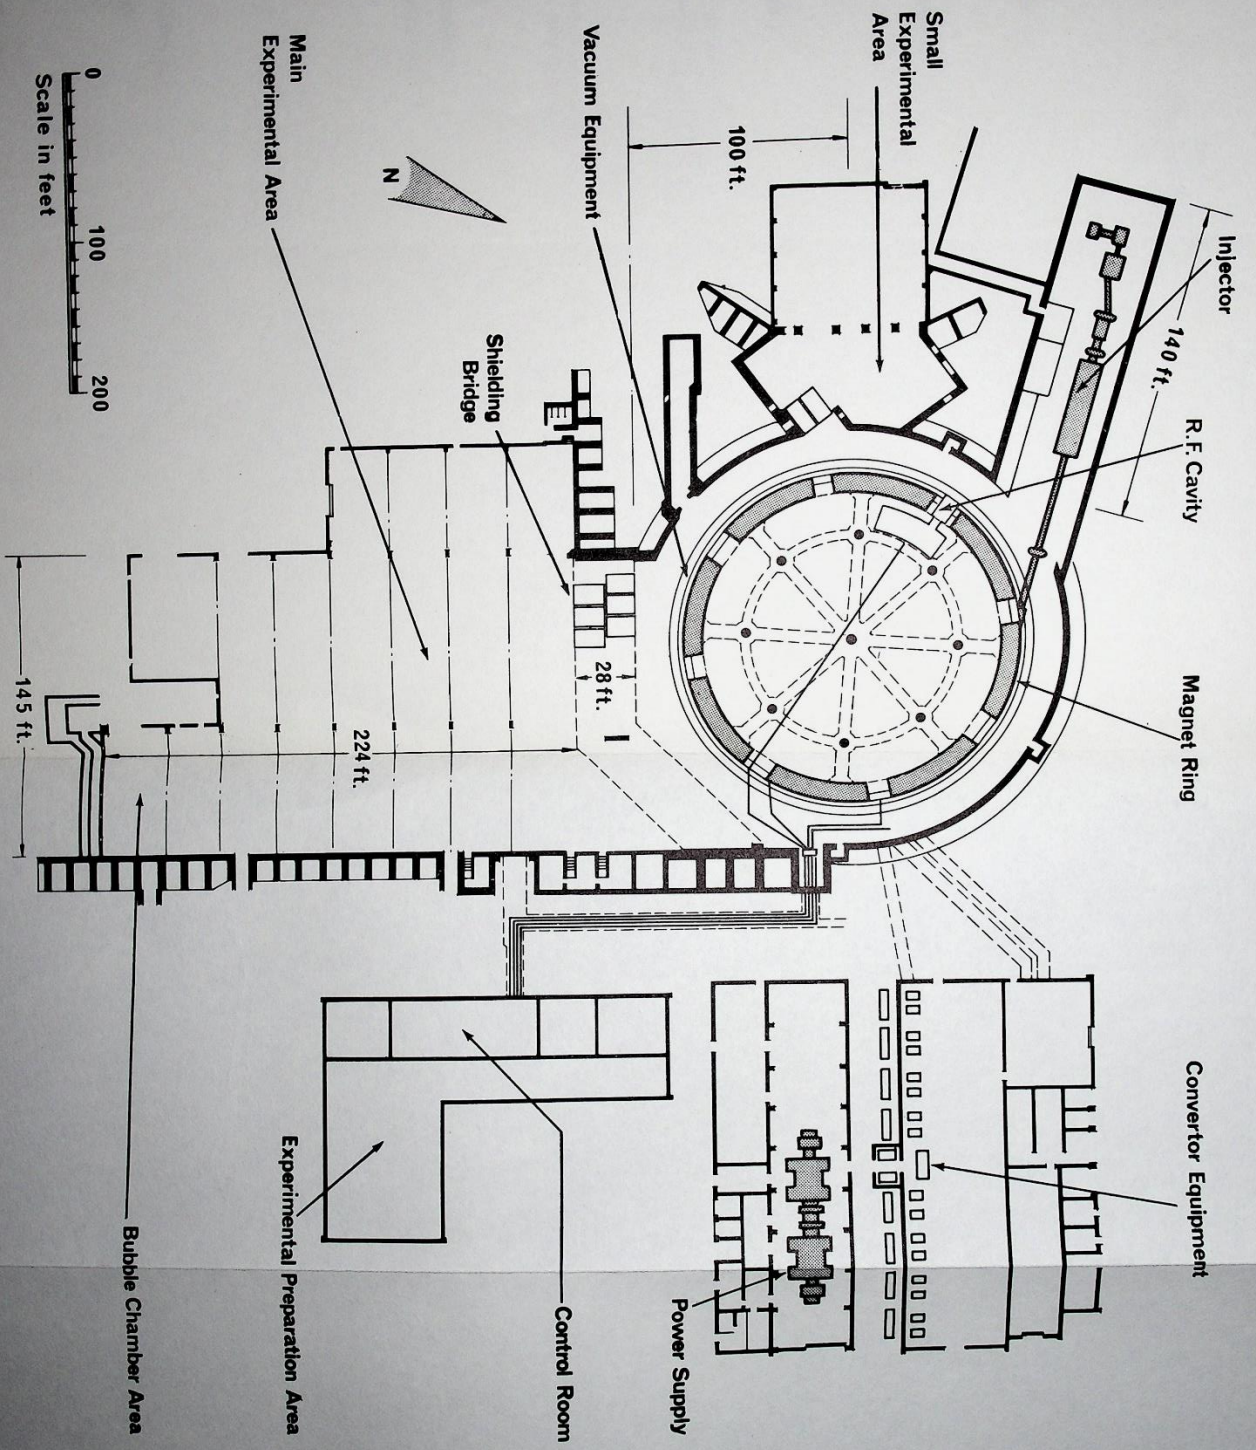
(i) A simplified plan showing the layout of the NIMROD installation.
